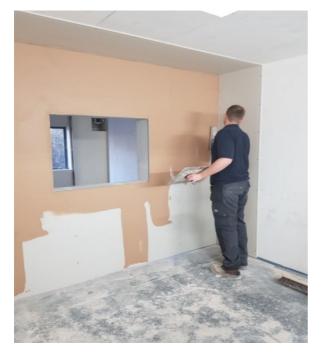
showing slight wastage of beads due to adjustments following a measurement/cutting error to one return (waste still within waste tolerance) Photo 24 – 28: Showing sequence of photographs of completed installation with plaster surface finish of wall and window trowelled and ready for decoration
